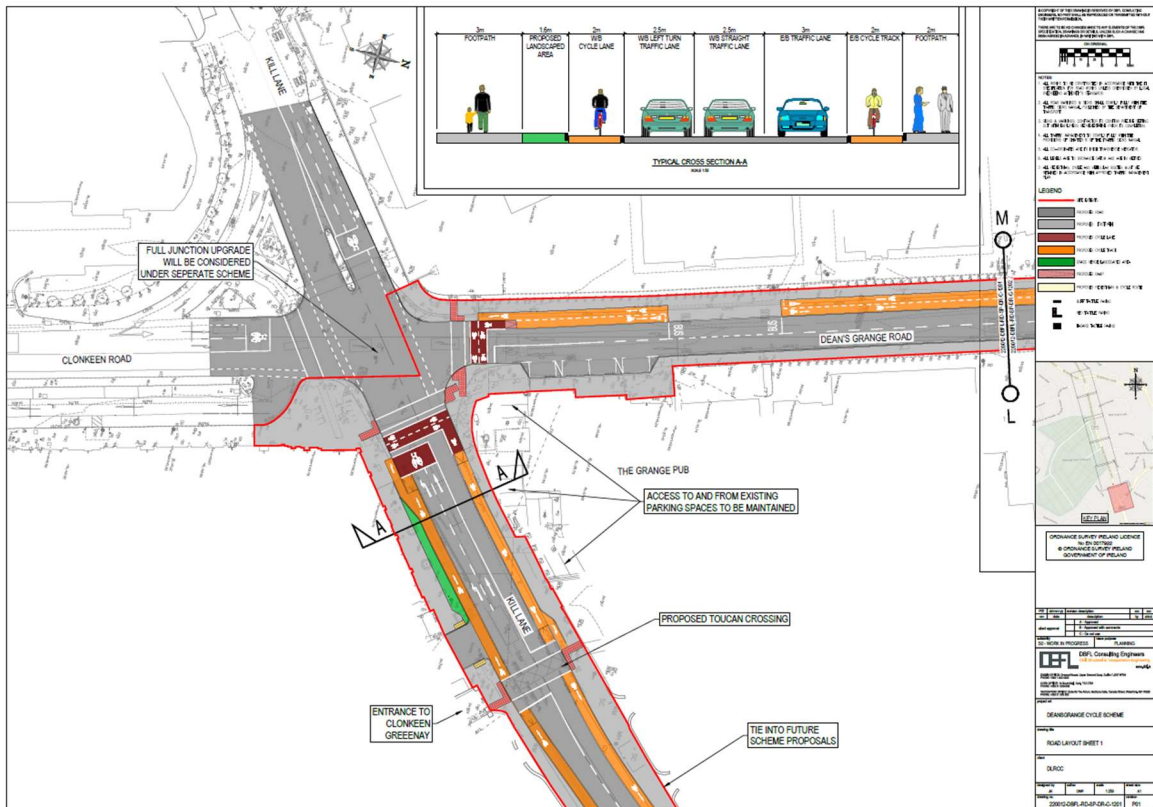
Preliminary Design for Kill Lane and Deansgrange Road (Southern Section)
